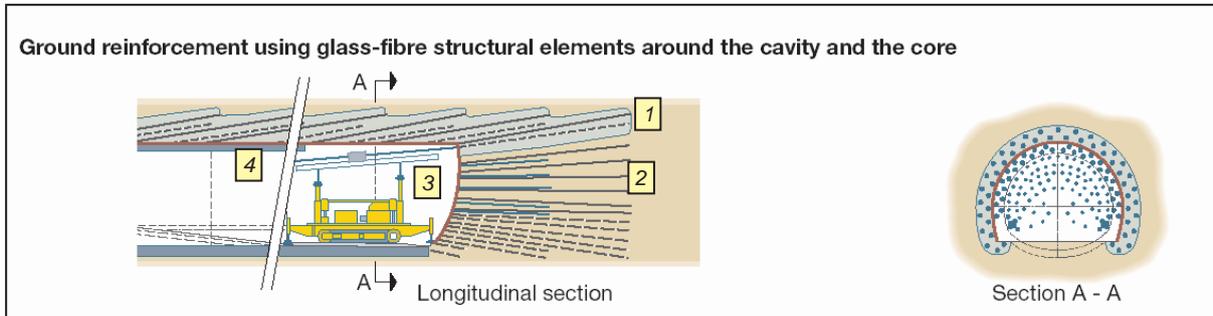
Full face excavation, face reinforcement and forepoling (after Lunardi, 2000)
